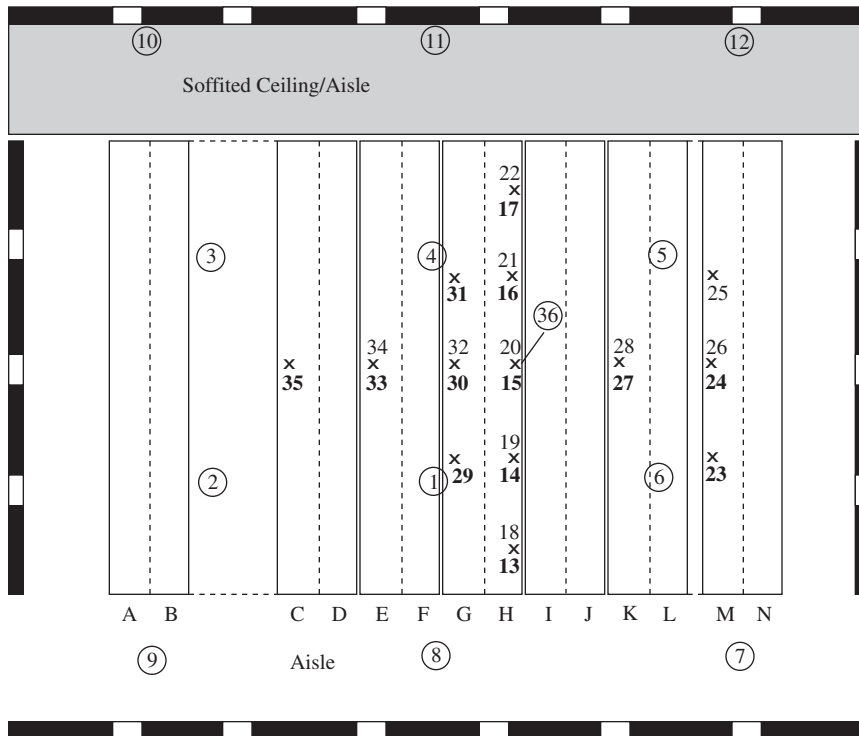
(e) Horizontal Sidewall and Pendent Sprinkler Layout.
